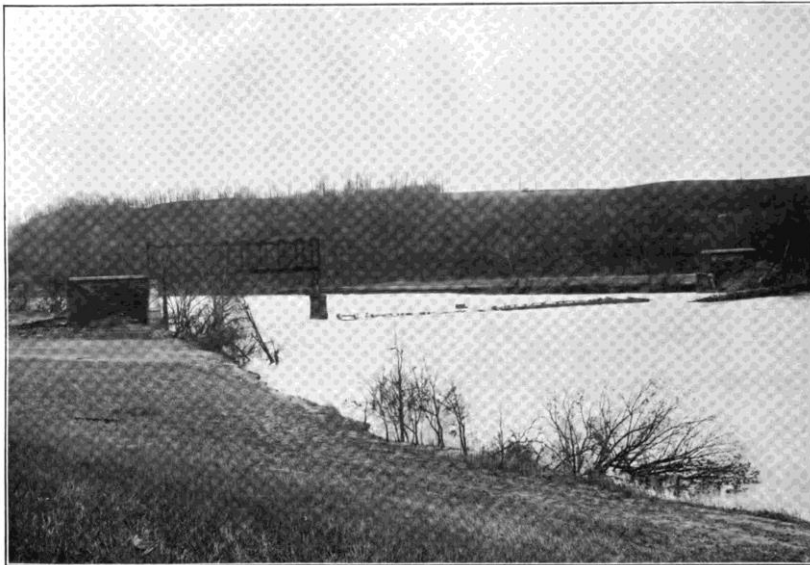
Photo of bridge in 1913 after the flood showing only the one Whipple through truss span still standing.
